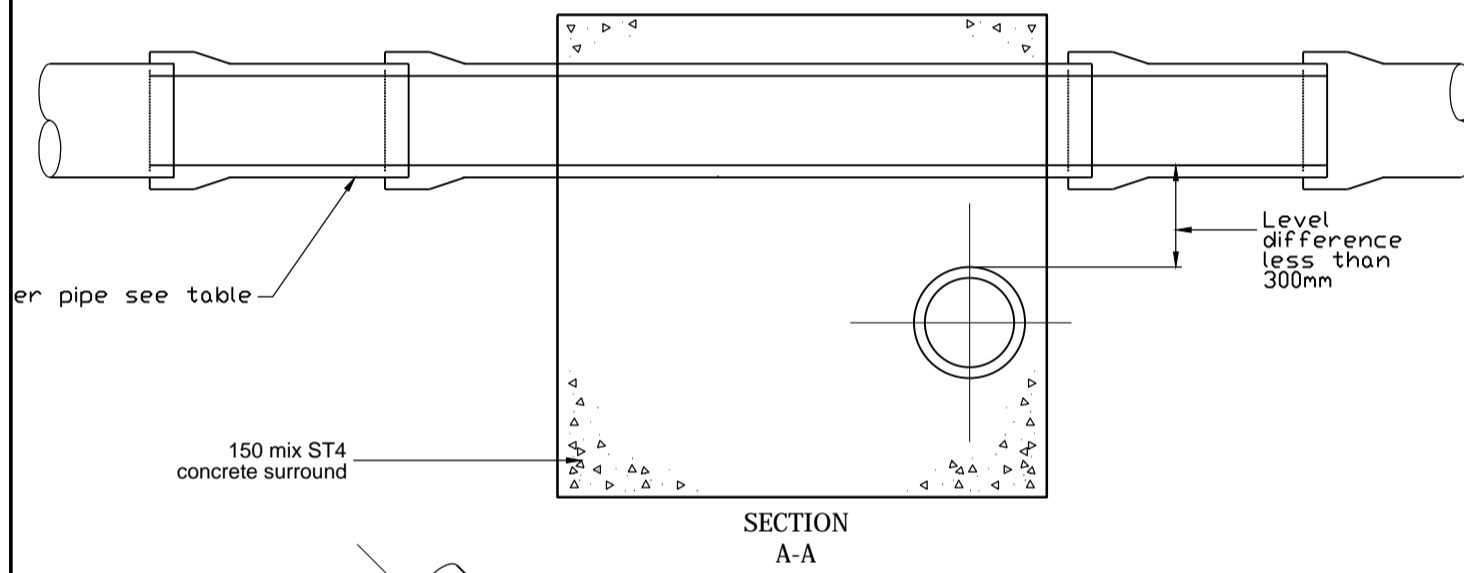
DETAIL OF INTERNAL FLOOR GULLEY
